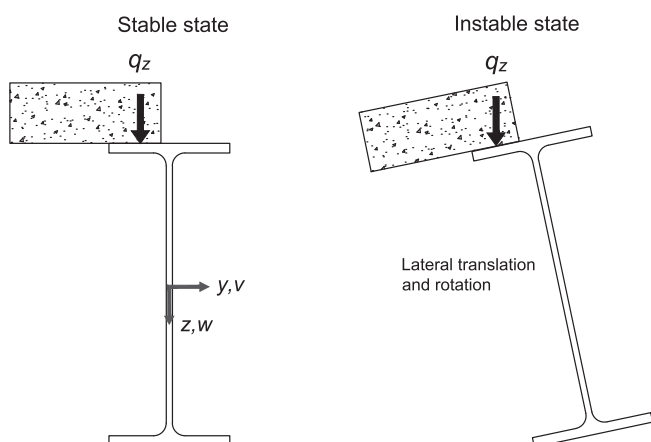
Sensitivity to lateral-torsional buckling of a steel beam loaded by a prefabricated concrete floor element.
